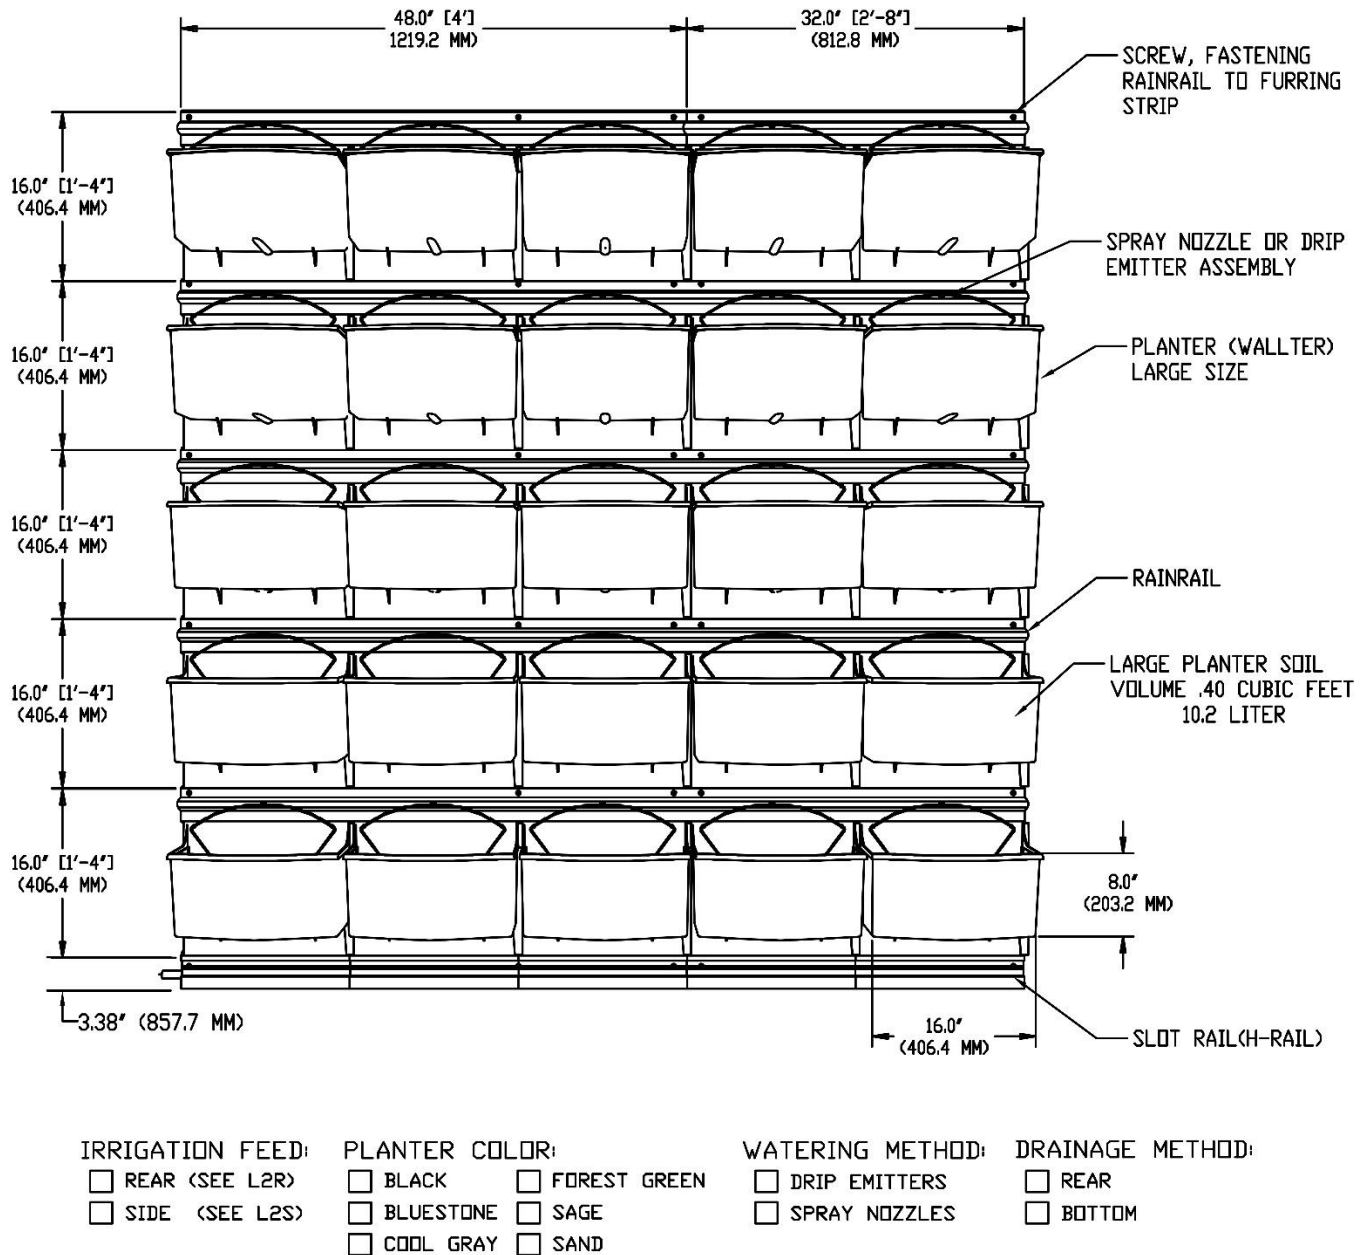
Living Wall Front View. Technical Details. (2020, March 20). Retrieved from <https://livewall.com/technical/details/>
